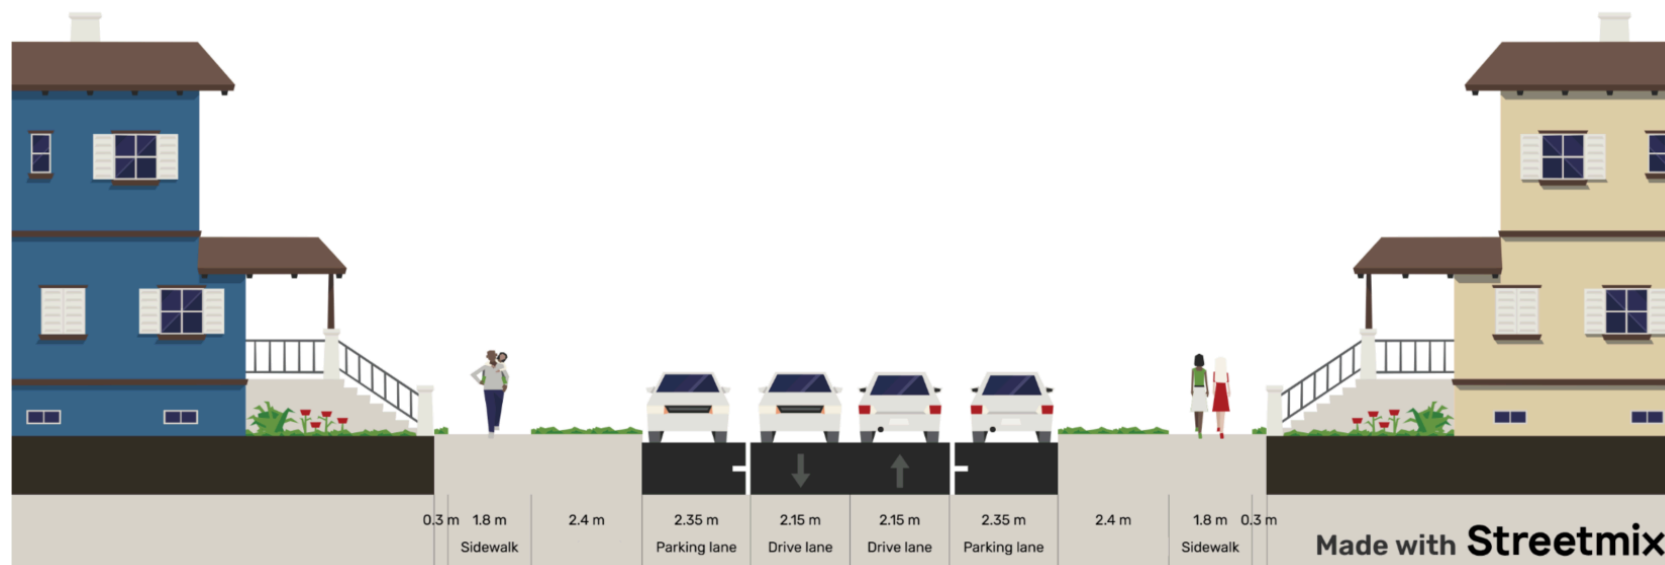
2018 Collector Road Standard (Base) - 20m ROW, 11.5m Road with 1.8m Boulevard walks
